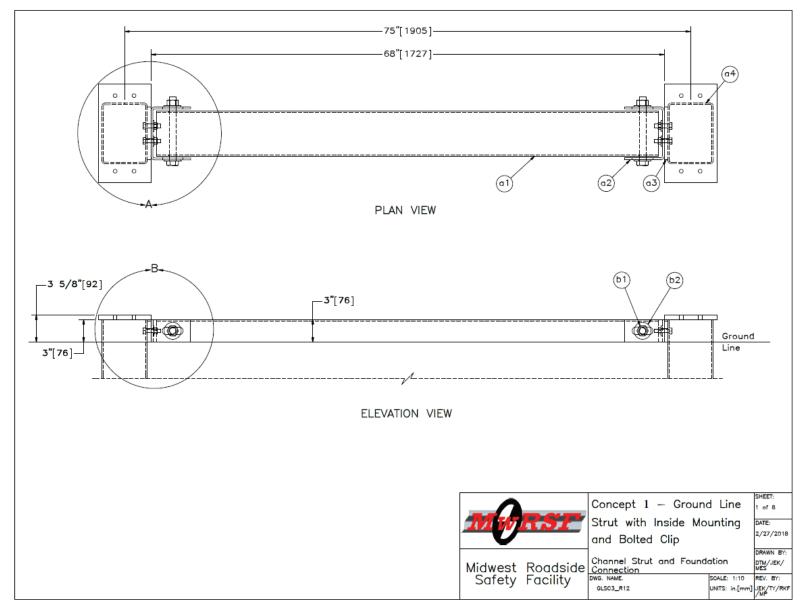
Ground Line Strut Design Concept No. 1 – Channel Strut and Foundation Connection
